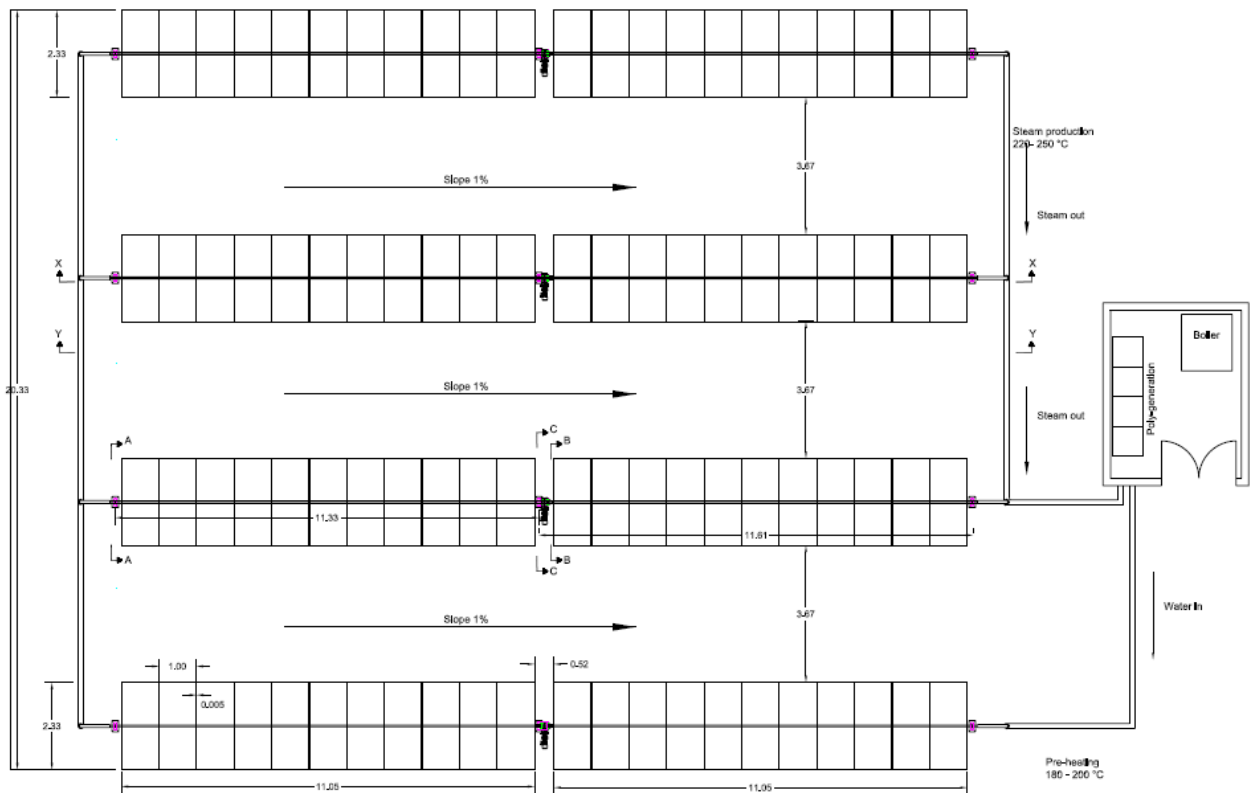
Layout plan of the station, showing the troughs and the turbine house
